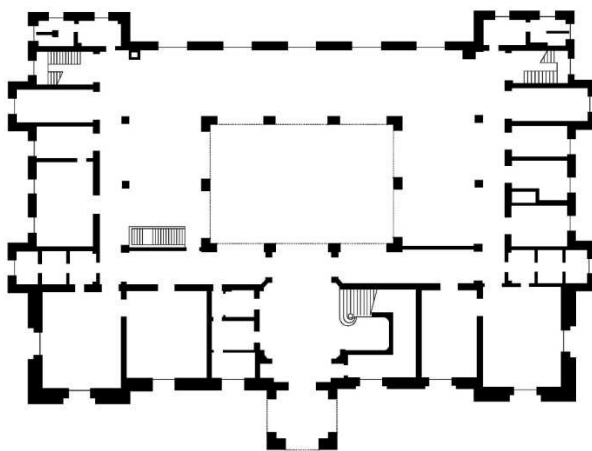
& 11. Ground Floor Plan of the Ottoman Bank (redrawn from the original drawing in Url 8) and the central service hall (Url 8)
